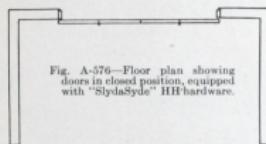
Floor plan showing doors in closed position, equipped with "SlydaSyde" HH hardware.
